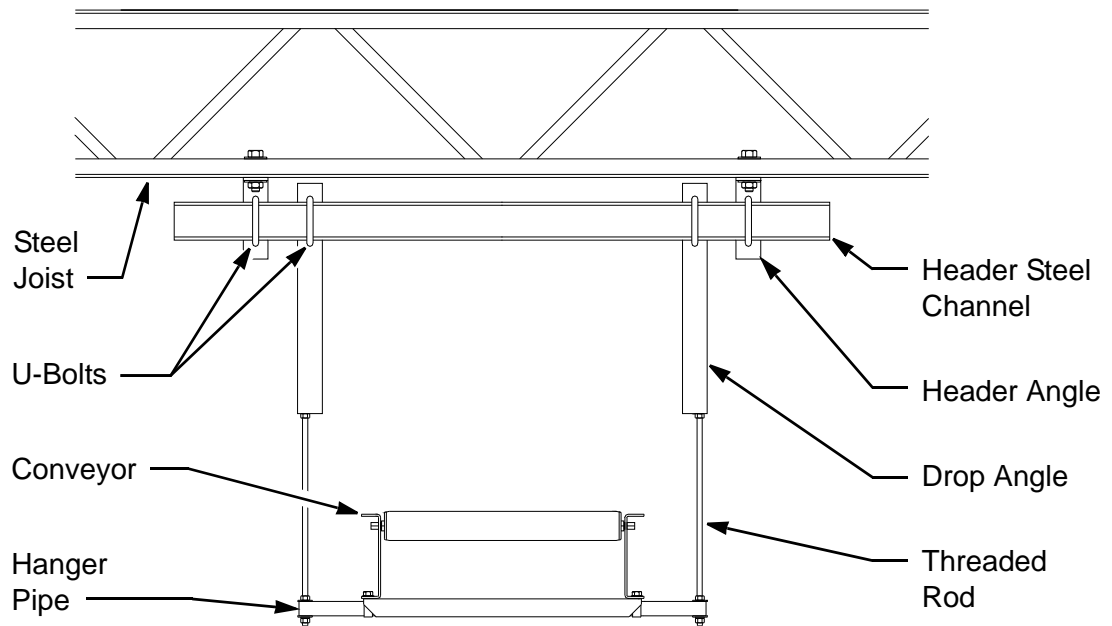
Typical Ceiling Hanger Installation (CH2-A Series Shown)
